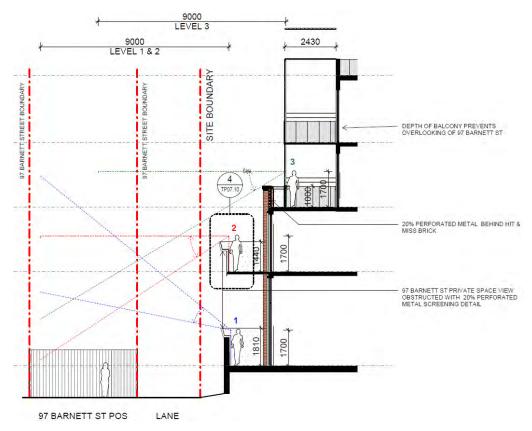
Overlooking Section 1 depicting proposed overlooking mitigation measures. From Drawing TP07.10
